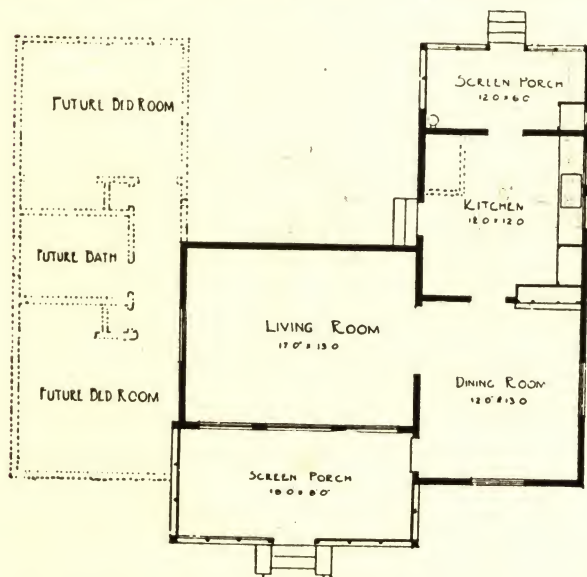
Floor Plan Showing Possible Addition in Dotted Lines
